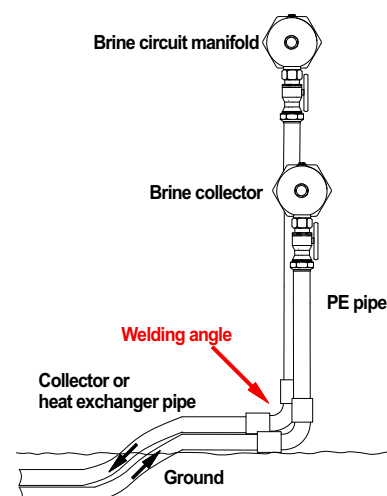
Mounting the pipework on the brine circuit manifold with a welding angle
